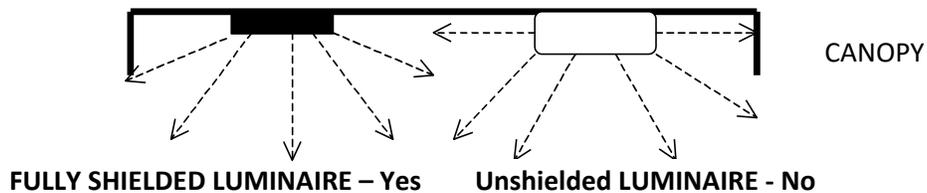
Building canopies, overhangs, roof eaves and similar types of construction shall not be considered as the means for providing the light cutoff. The cutoff characteristics shall be achieved by the luminaire itself.
